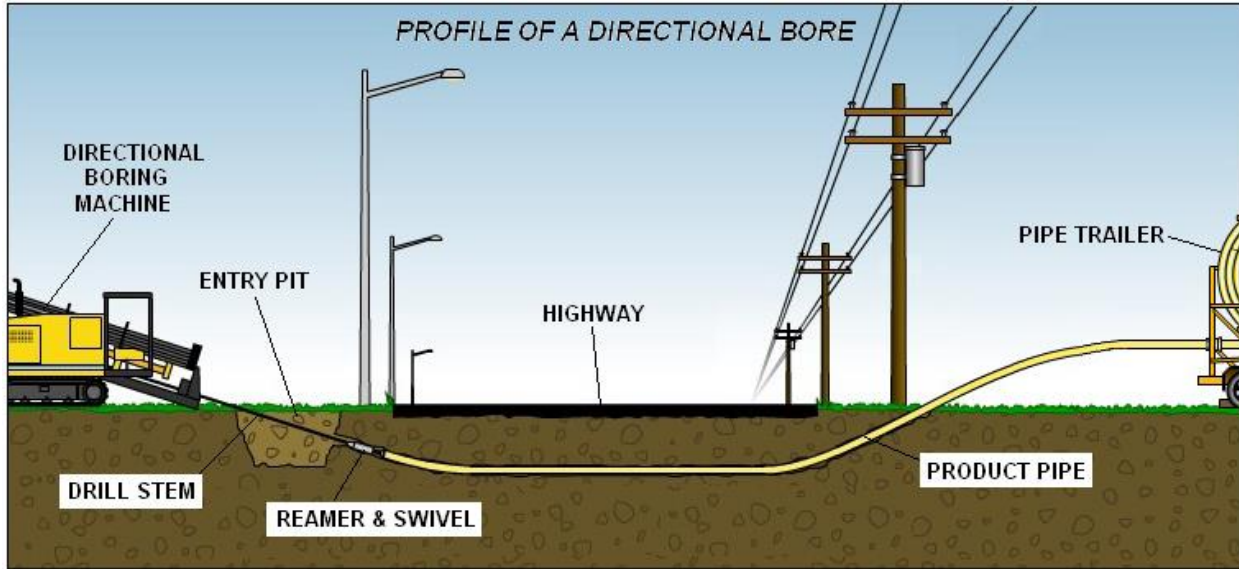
Direction boring schematic for typical road crossing, showing entry pit and directional boring equipment (photo credit: <http://freedomutility.com/process.php>).
